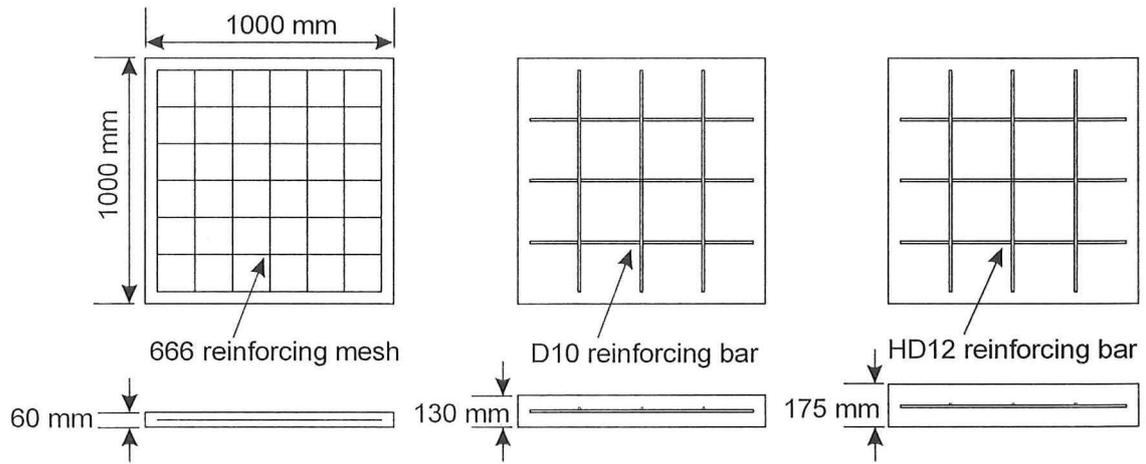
Plain slabs specimen nominal dimensions and reinforcement
